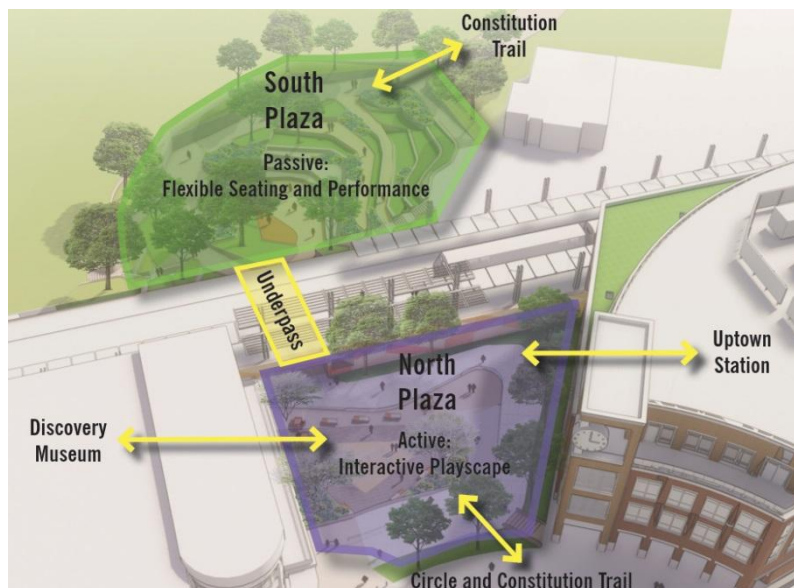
The underpass connects the north and south sides of Uptown via plazas surrounded by key destinations
